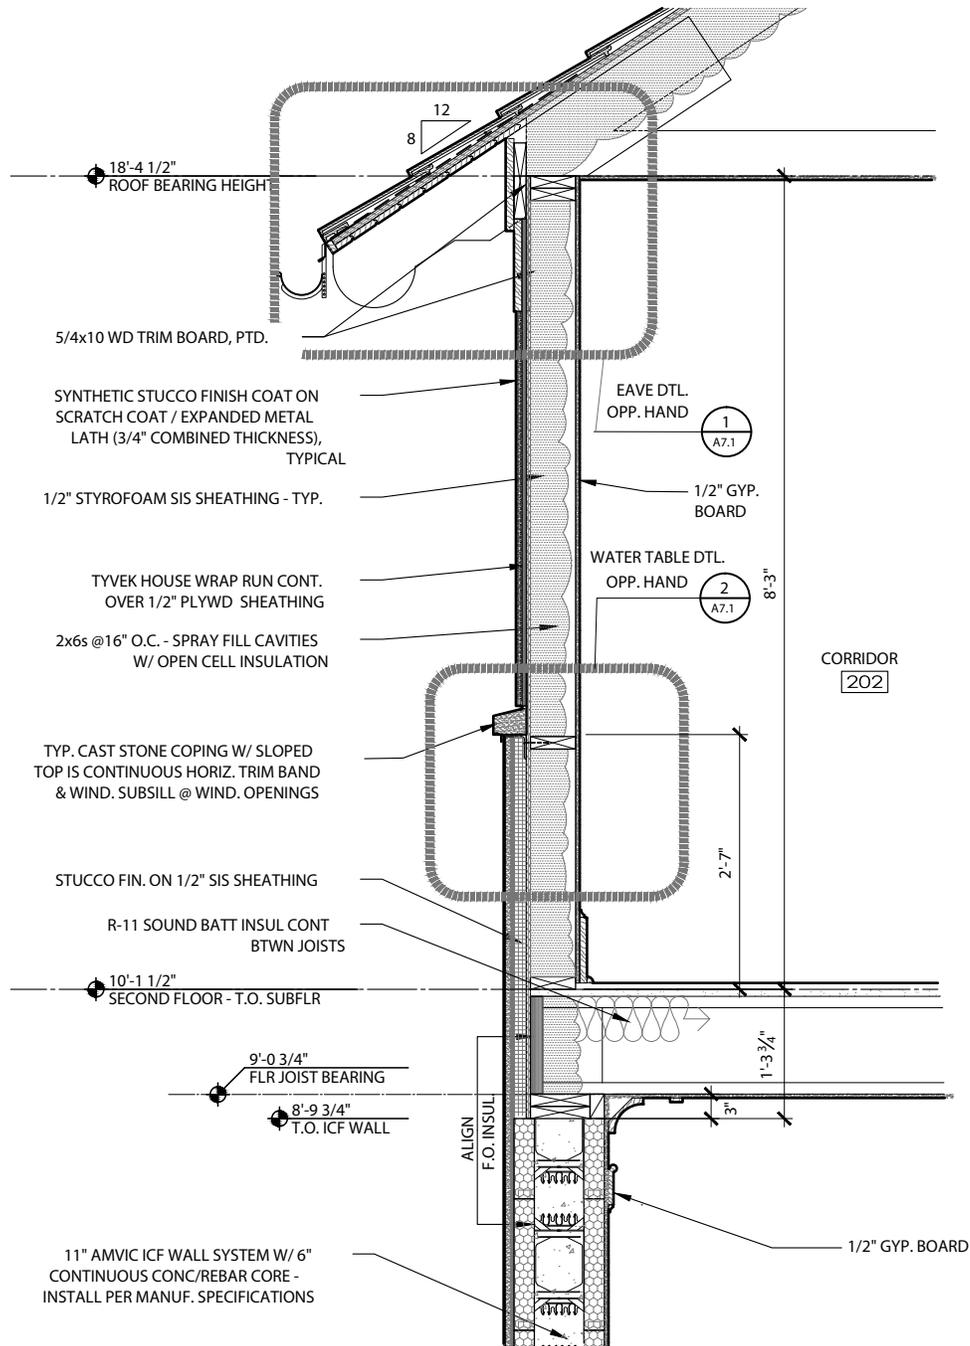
Residential wall section submitted by brwarchitects in Charlottesville, VA. Notice the designer has used SIS sheathing as a thermal break, called out Tyvek house wrap to run continuously over sheathing, and specified open-cell spray foam insulation (brwarchitects).
